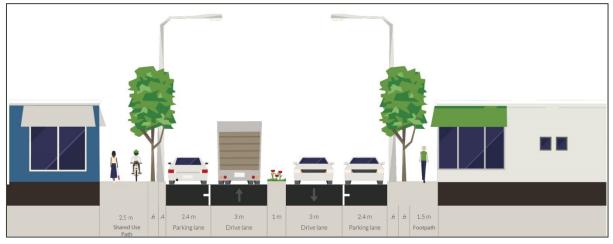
Indicative Meander Valley Road Town Centre Cross Section
